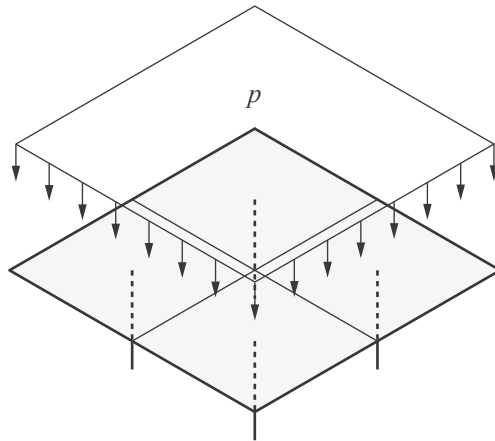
Continuous floor supported on four columns, subjected to a distributed load q
